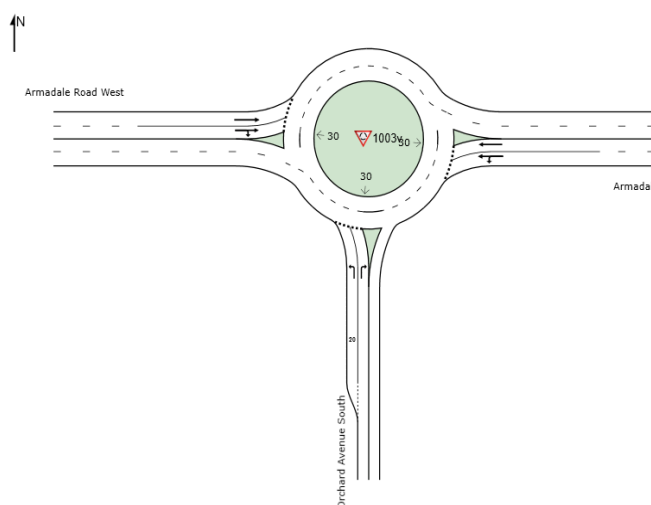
Armadale Road/ Orchard Avenue – Roundabout option
